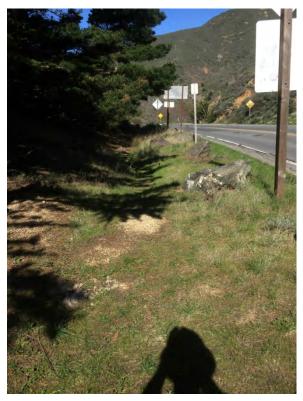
Road shoulder, west side of State Route 1, north aspect (2/7/2018).
